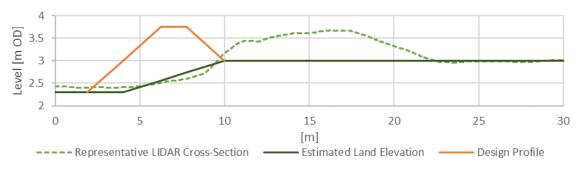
Cross section showing land elevation and new embankment along Section 1.
